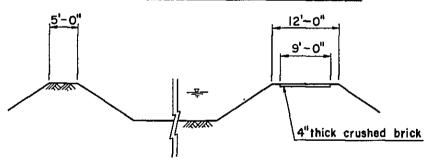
PROPOSED CROSS SECTION OF MAINTENANCE ROAD
